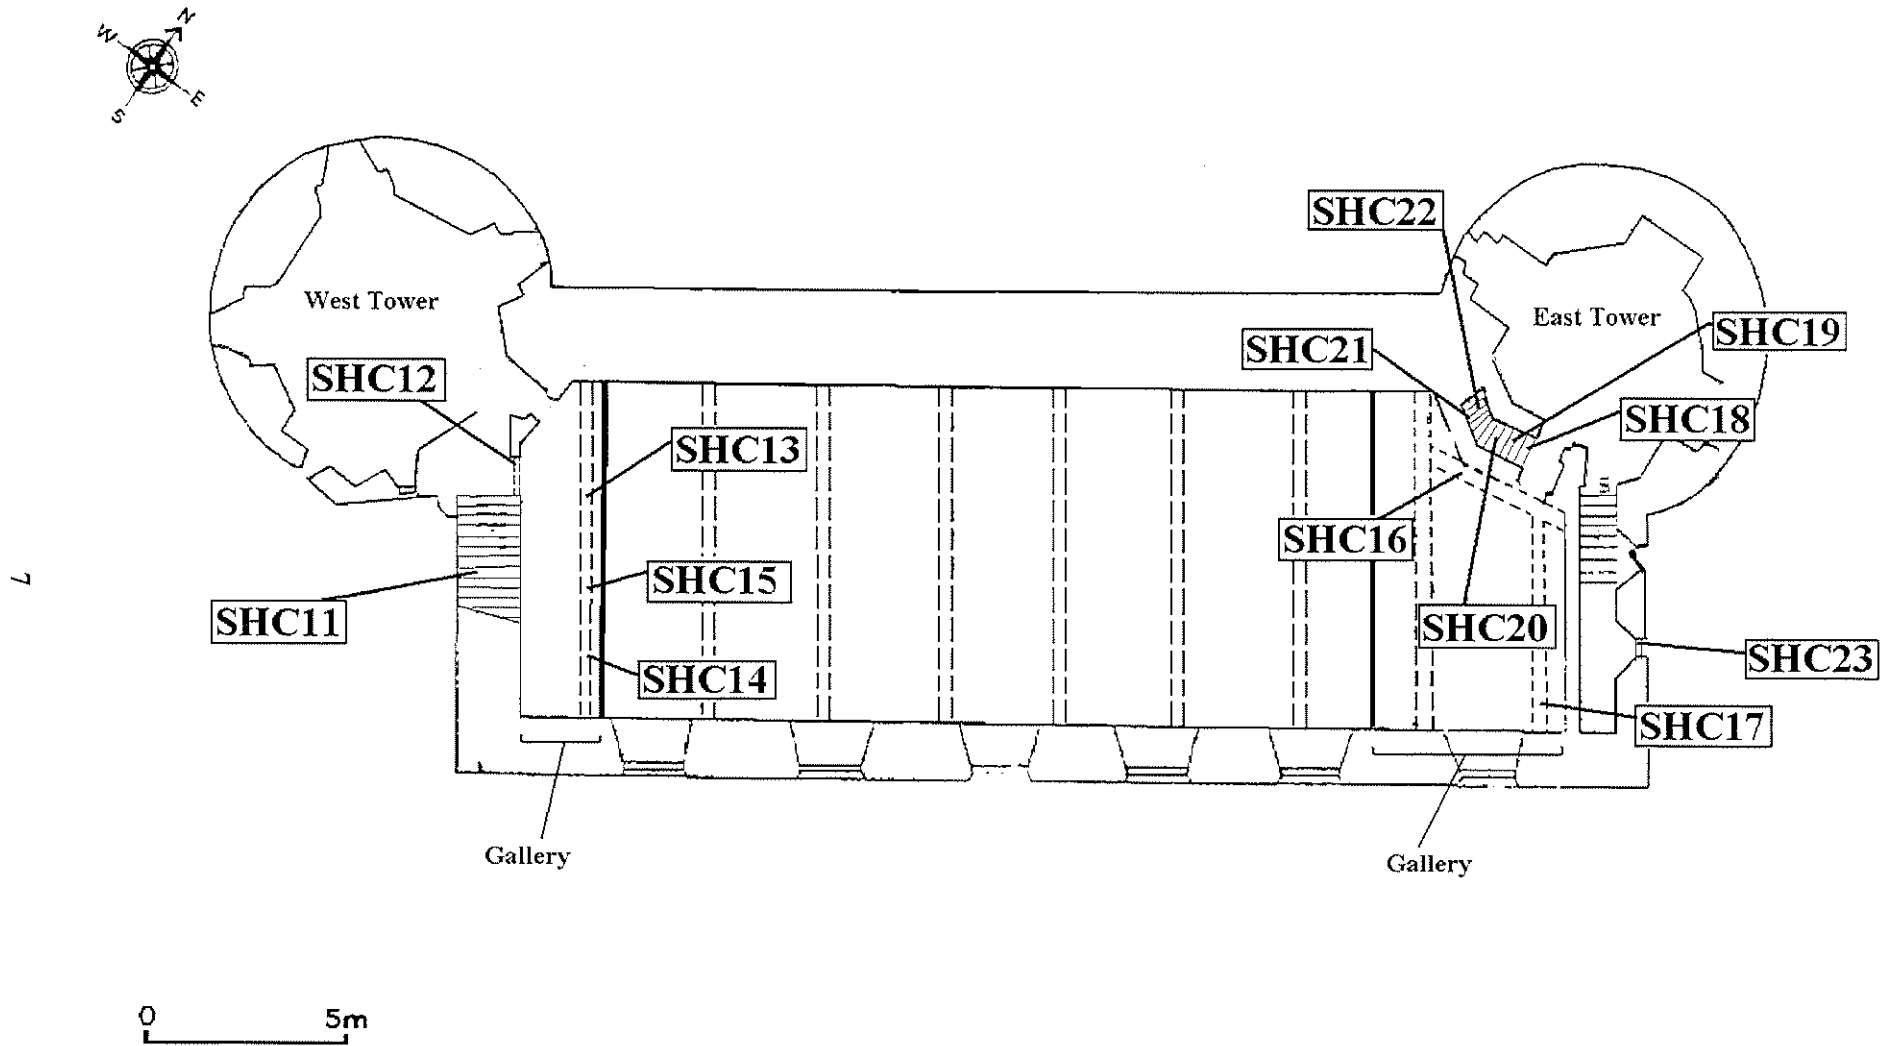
Second-floor plan of the Hall range, showing the timbers sampled for dendrochronology, adapted from an original drawing in Morriss (2001 unpubl, fig 8)
